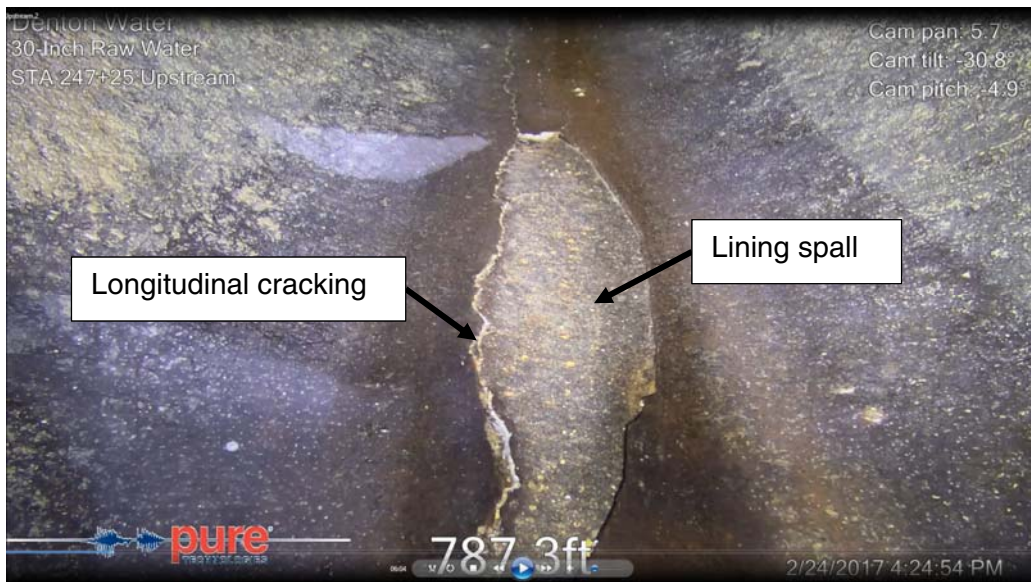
Pipe 2506, Longitudinal crack with lining spall at invert, 787 feet from insertion
